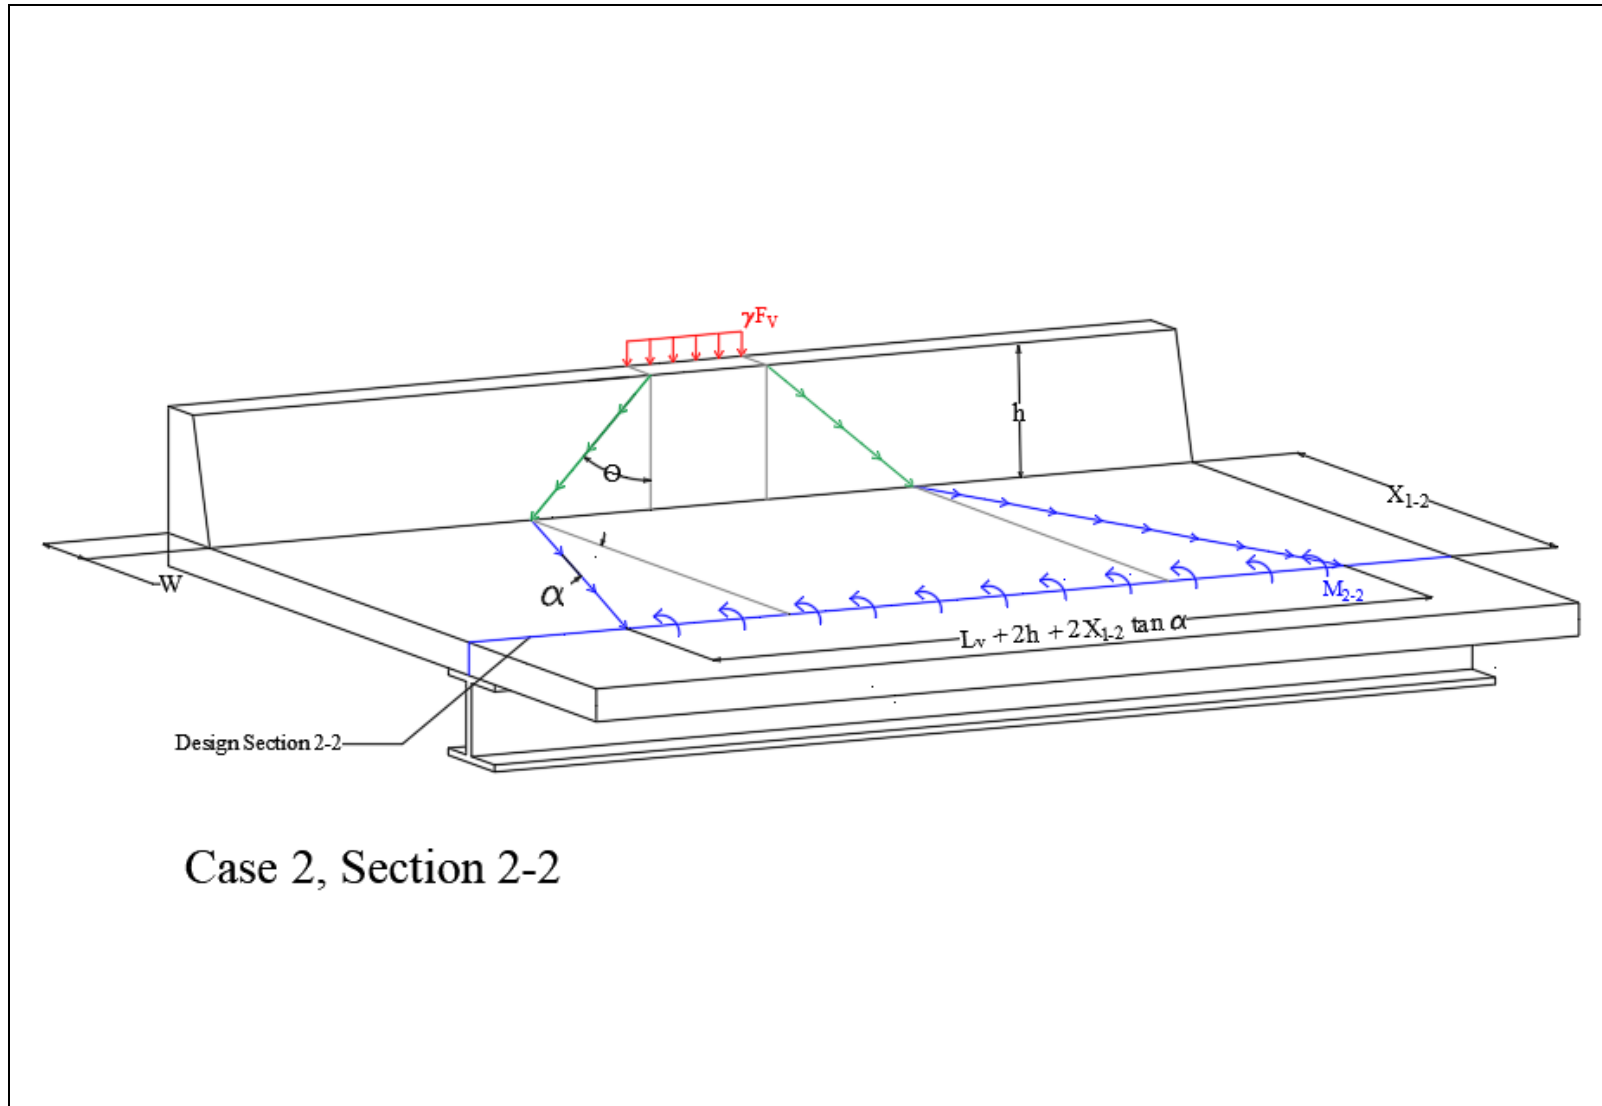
Generic Bridge Rail for Load Case 2, Section 2-2
